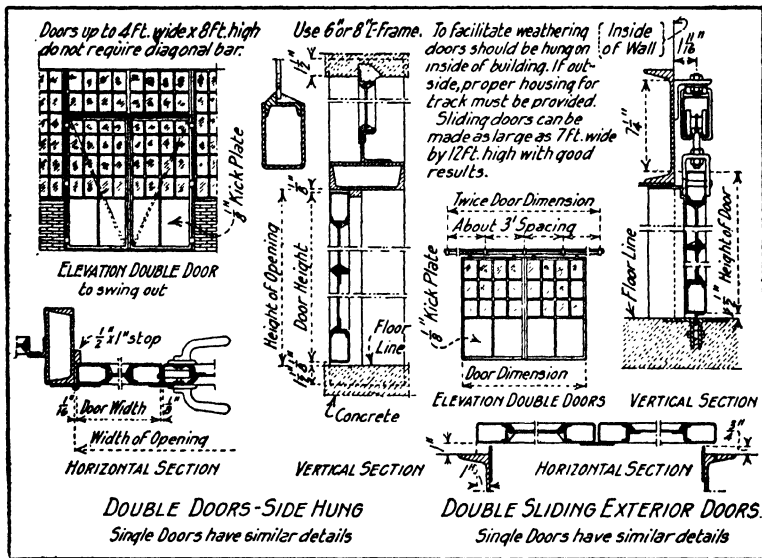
DETAILS OF "FENESTRA" TUBULAR STEEL DOORS.
